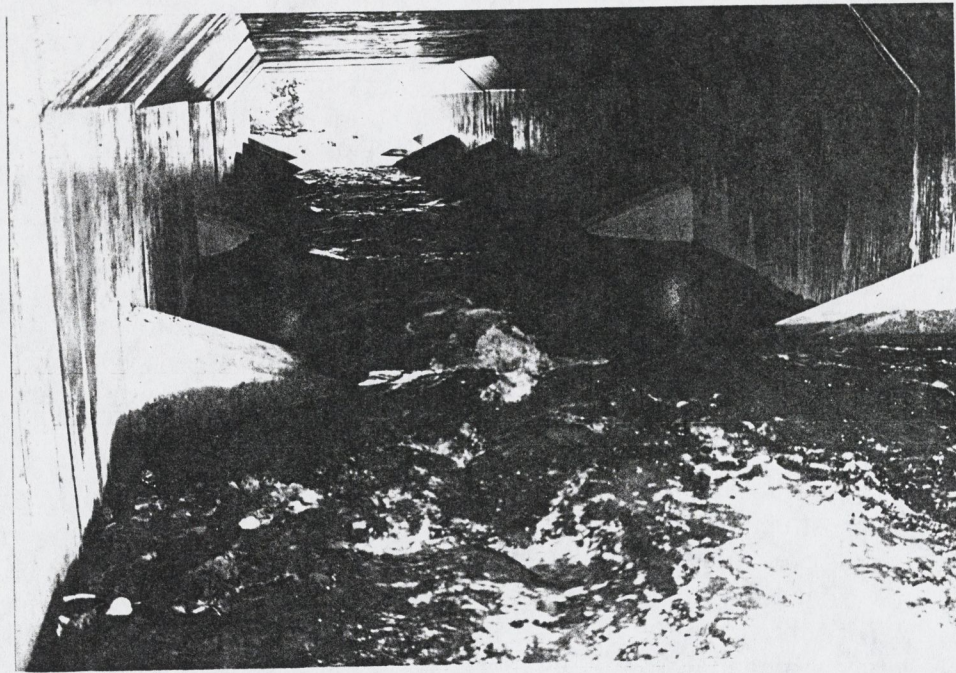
U.S. Highway 93 - Cow Creek Culvert
